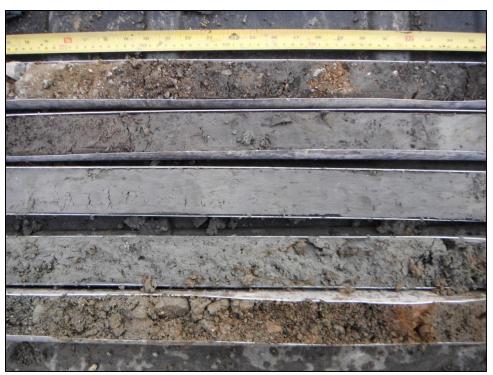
Core samples from TBL 21, center of 4-foot units from top to bottom: 0-4 feet, 4-8 feet, 8-12 feet, 12-16 feet, 16-20 feet.
